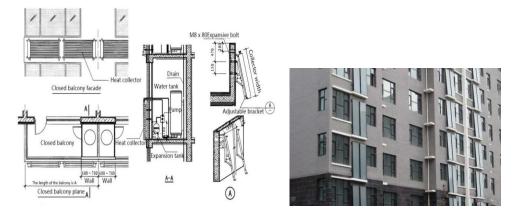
The balcony system installation drawing Figure 5: The project of solar collectors installed on metope
